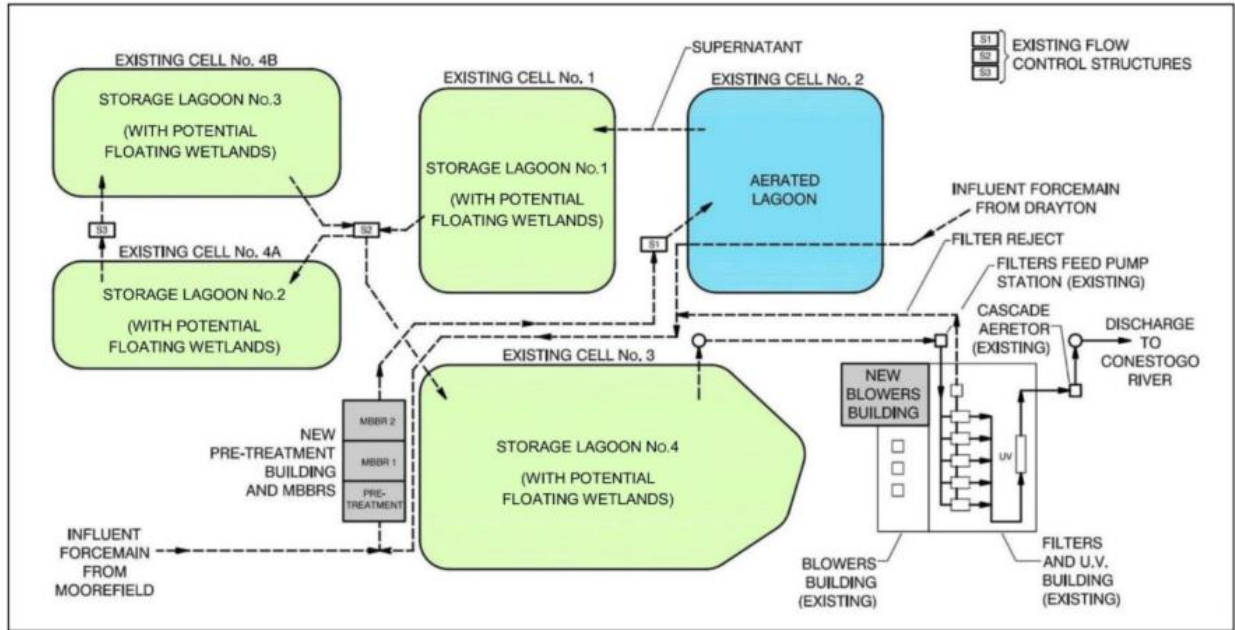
Proposed MBBR System Layout From the 2017 ESR
